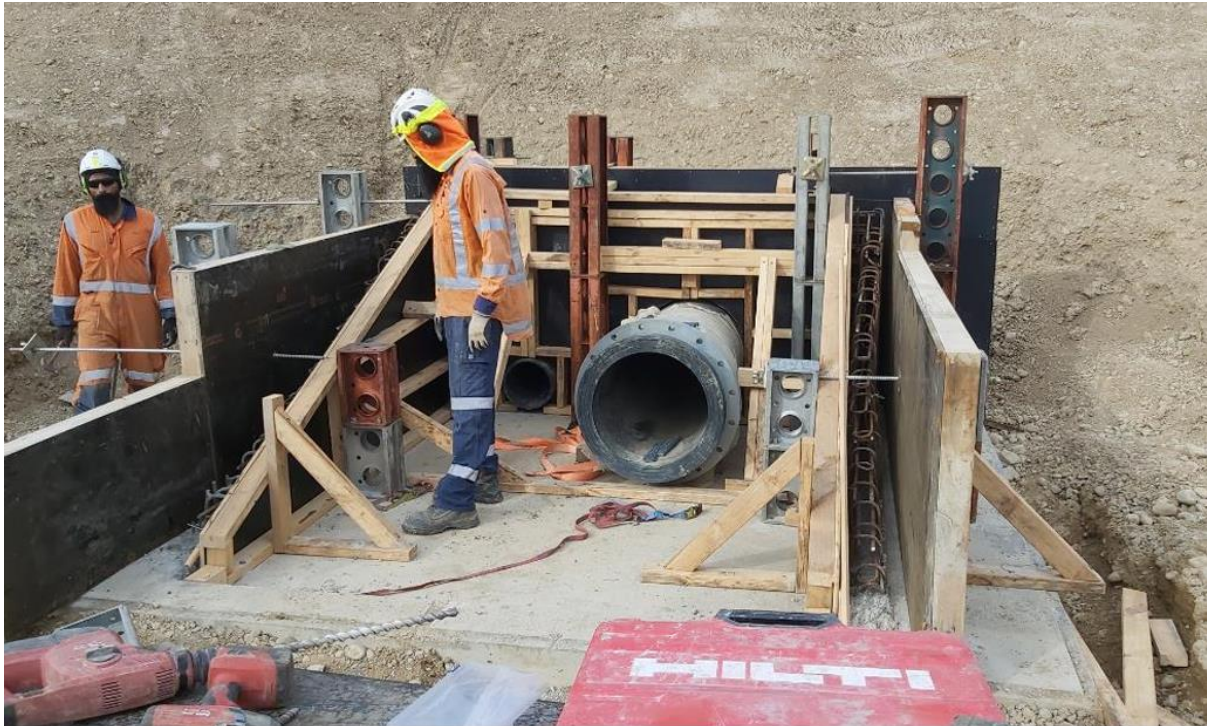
15th Feb 21 – Concrete works to Pond 2
